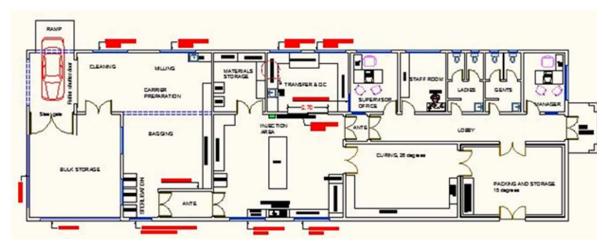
Floor plan of the inoculant factory under construction at IITA, Nigeria
